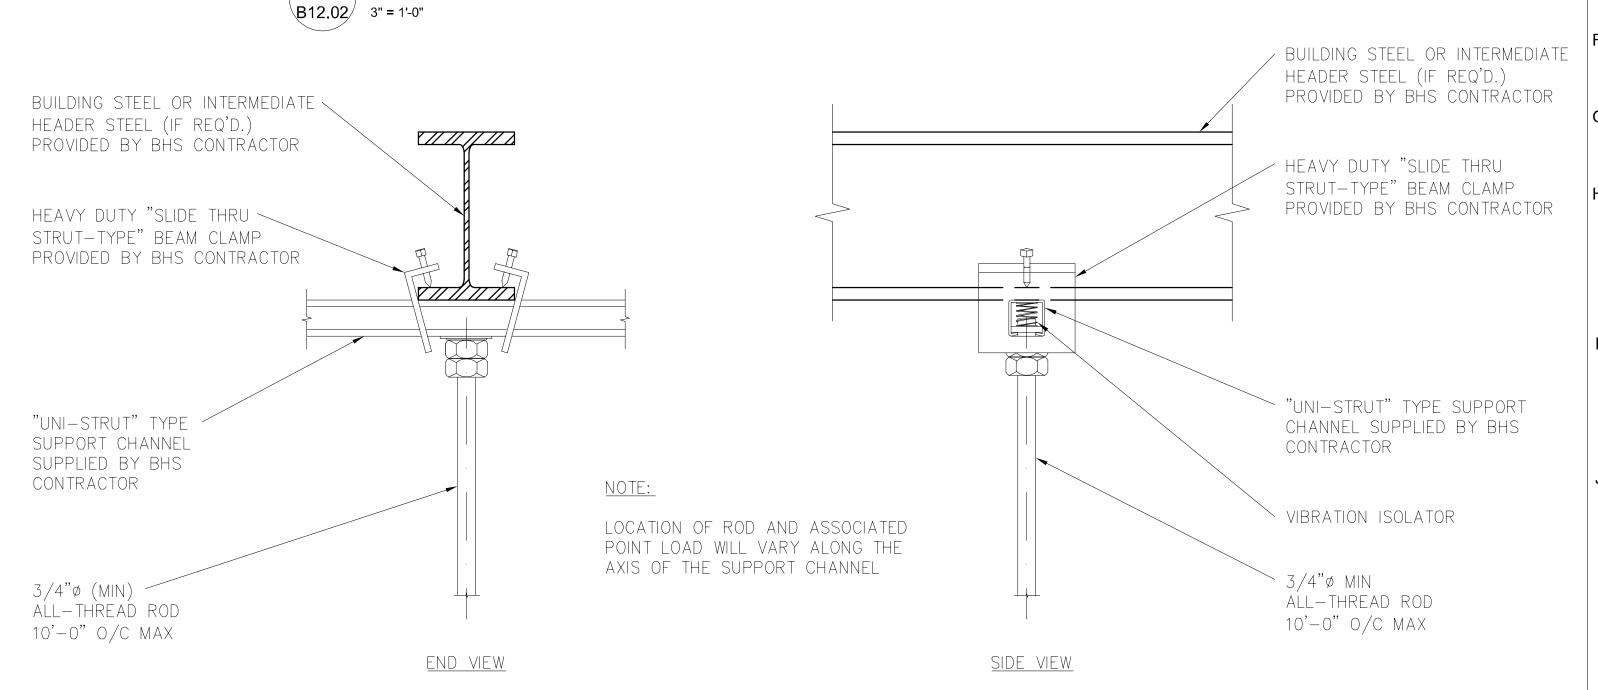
### DETAIL SECTION - CONVEYOR AND CATWALK HANGER SINGLE SILL SUPPORT
